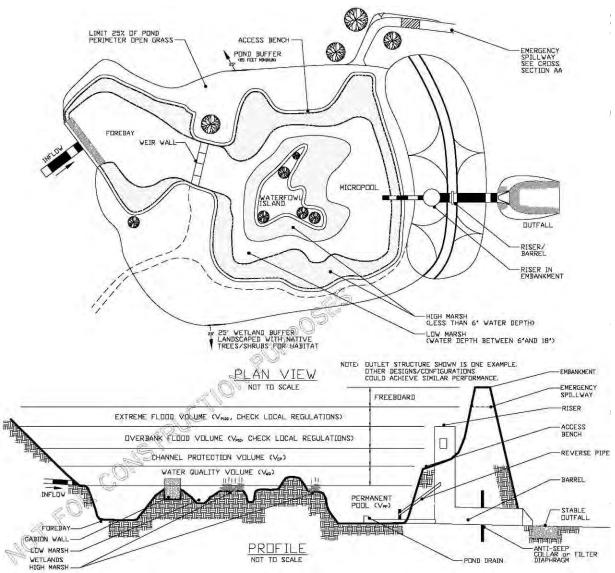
Design recommendations for stormwater wetlands (plan and profile).
